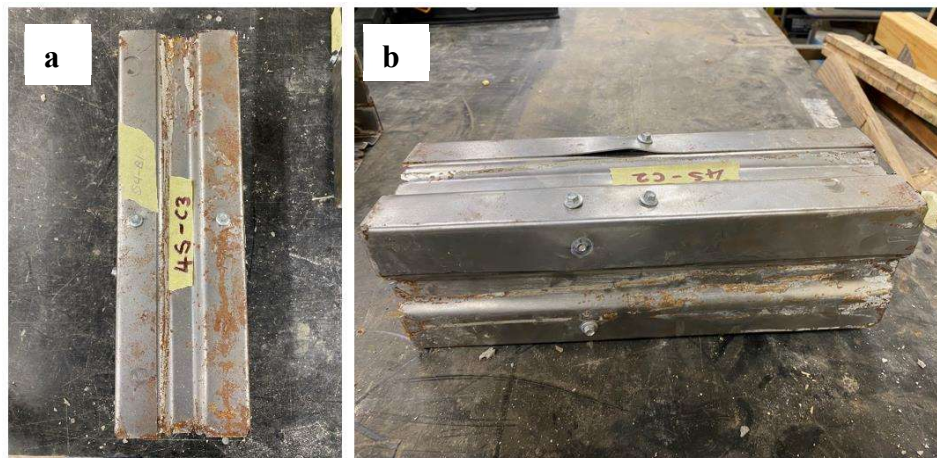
Specimen before deconstruction (a) Screw heads remaining intact (b) Bulging of steel sheet.
